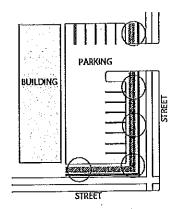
Landscaping Buffer with Evergreen Plantings-Plan View
